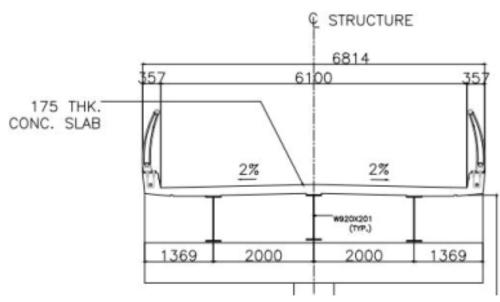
Example 1: Ramp Elevated by Steel Girders
